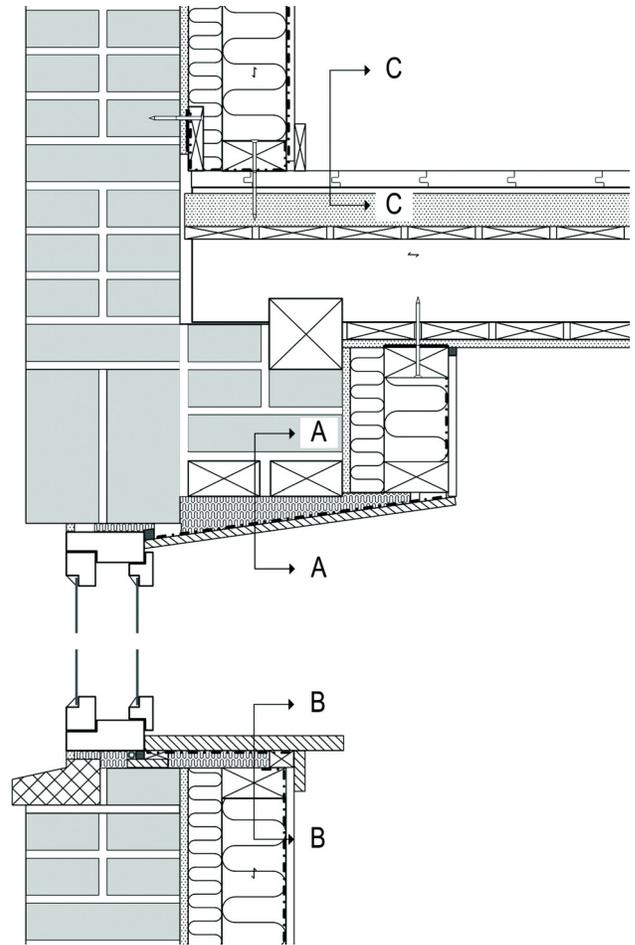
Vertical section of the joint between the load-bearing exterior wall and the horizontal division at the window wall after post-insulation.
